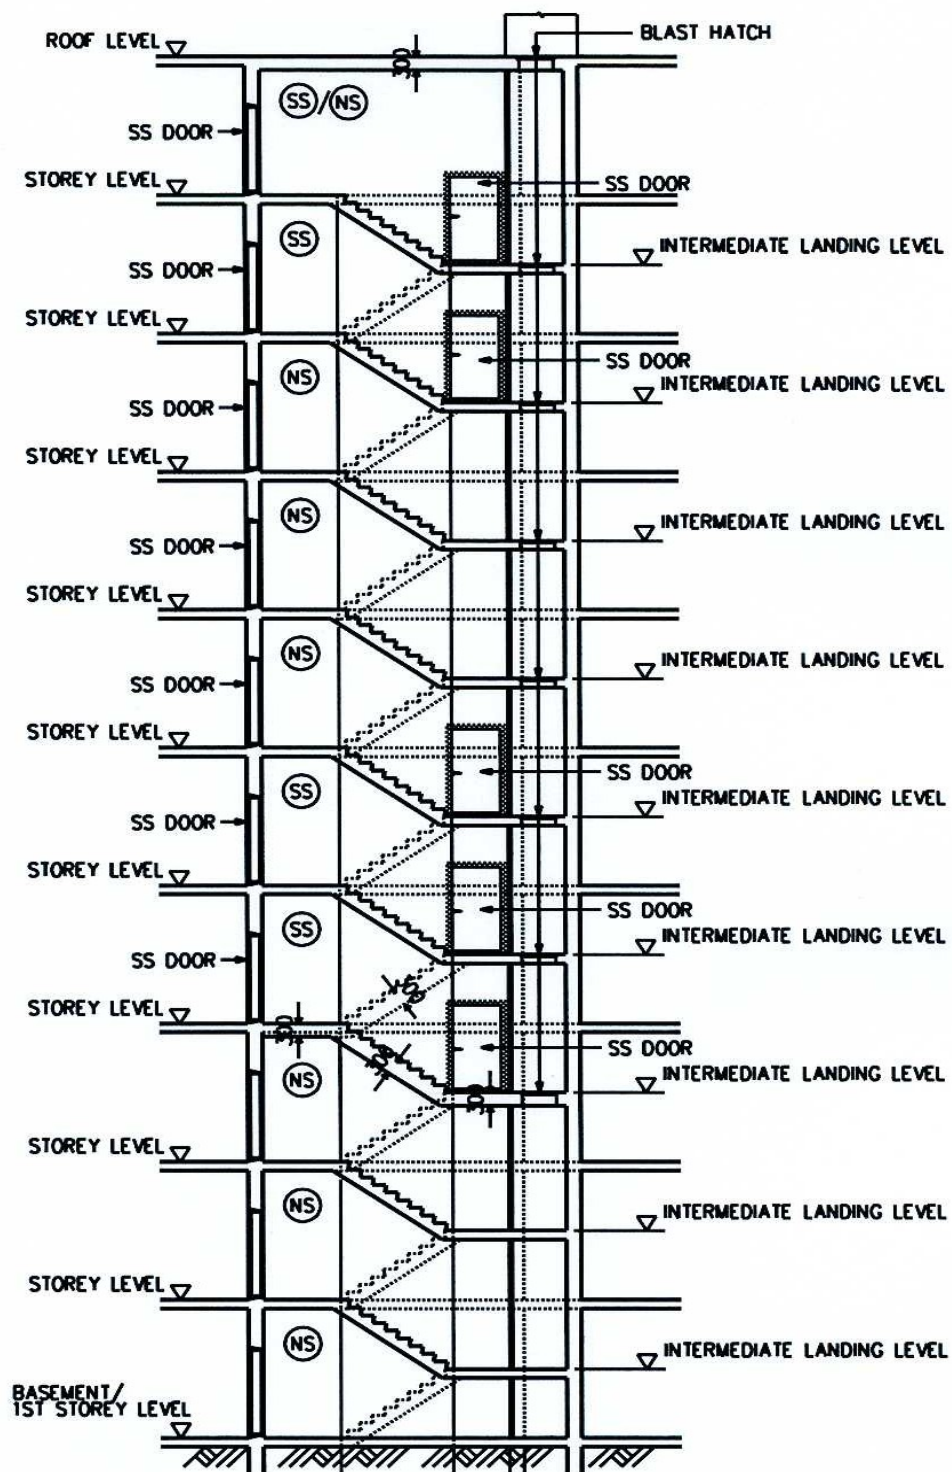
SECTION OF STAIRCASE STOREY SHELTER WITH SS / NS
